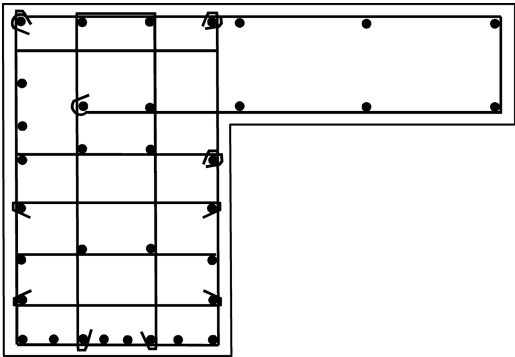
C.3 Typical reinforcement in longitudinal beams with cantilever projection.
